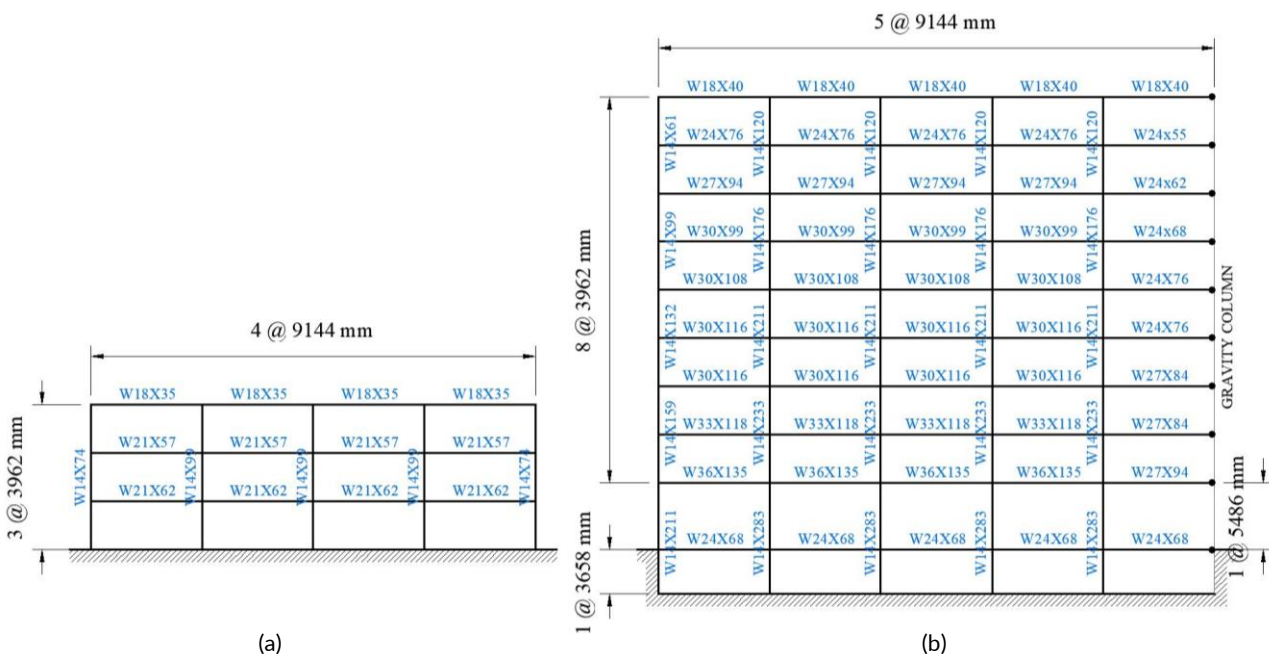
Dimensions of N-S perimeter steel MRF for (a) building 3B and (b) building 9B, as reported in [20]
